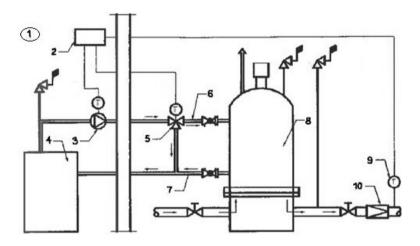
Scheme of the heating system, operating with circulator pump [3]
